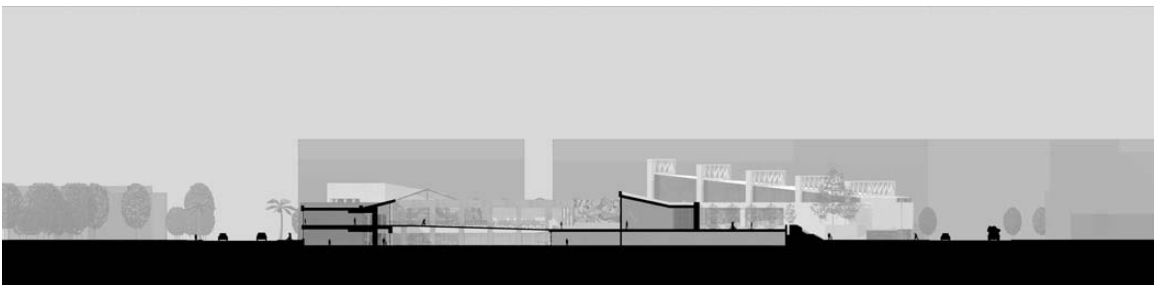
Site Section Facing North in Proposed New School of Orlando Campus
